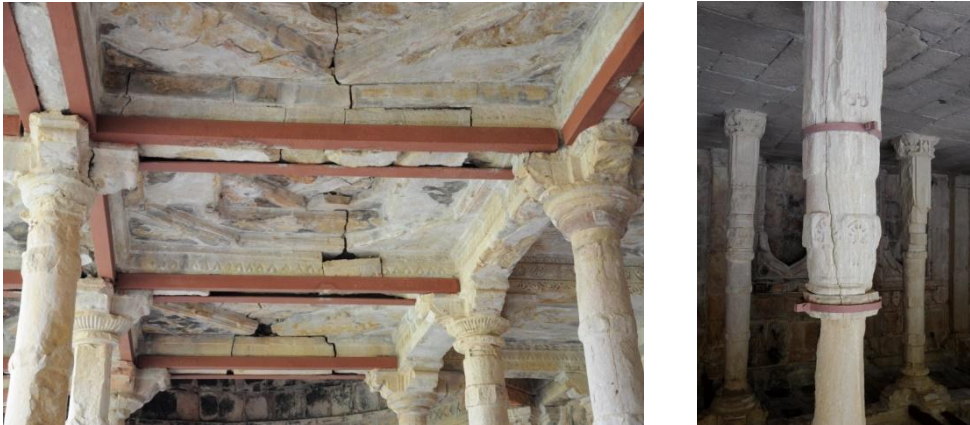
Existing Condition of the roof and Columns before Reinforcement
